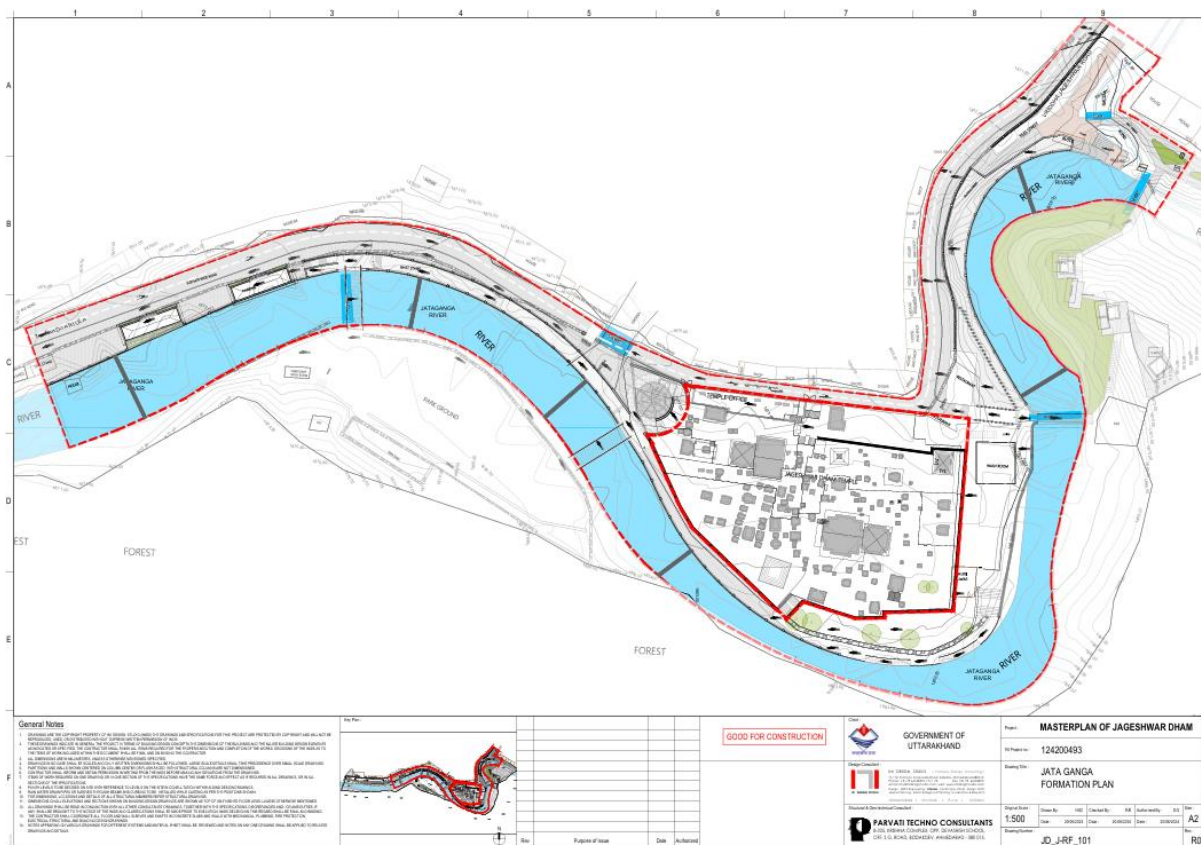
Masterplan of Jageshwar Dham and Jata Ganga Formation Plan
